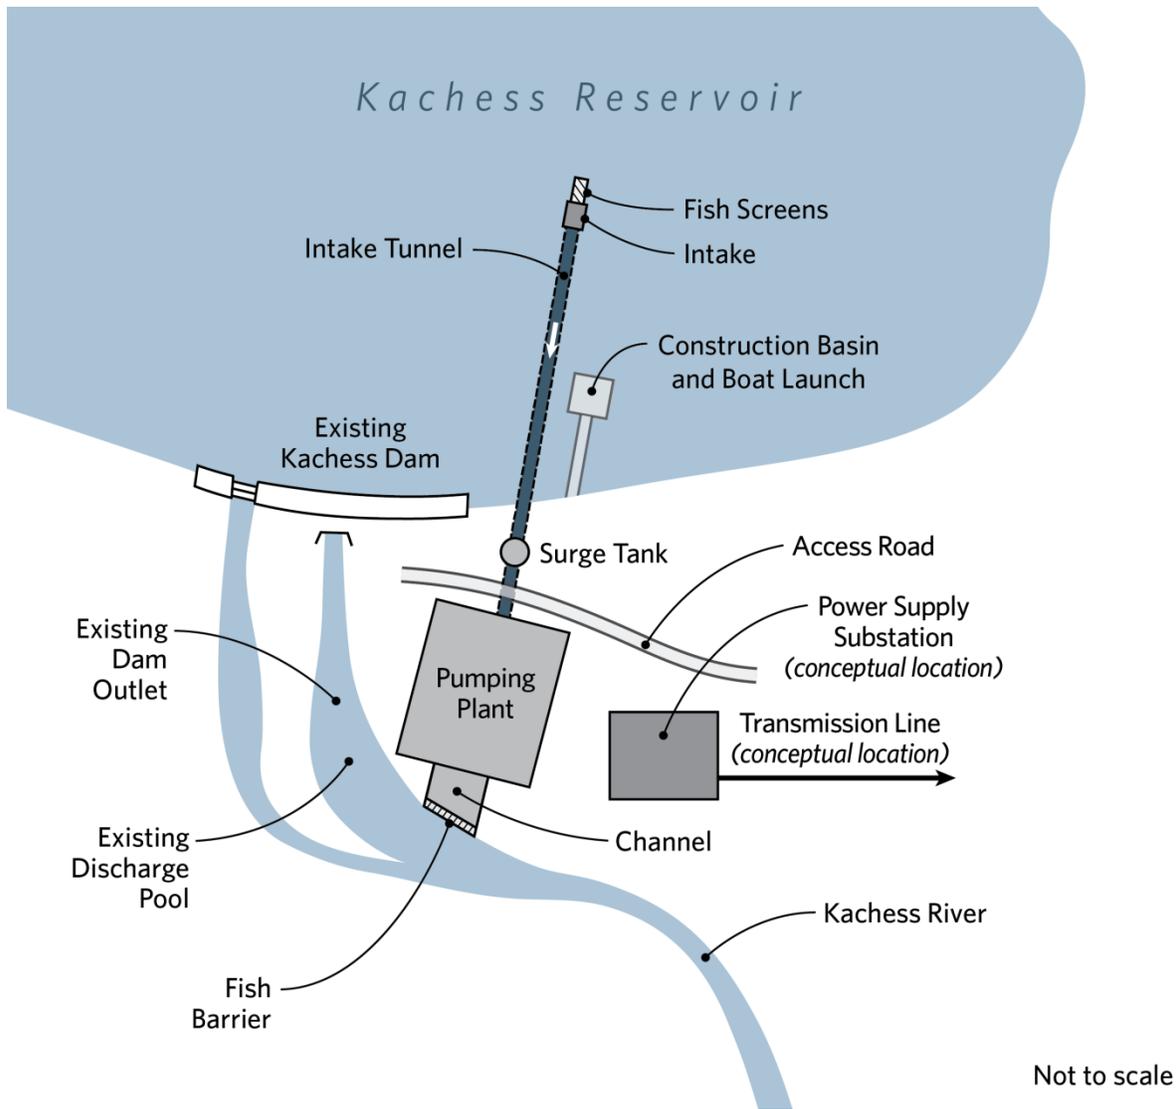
KDRPP South Pumping Plant Conceptual Site Plan
